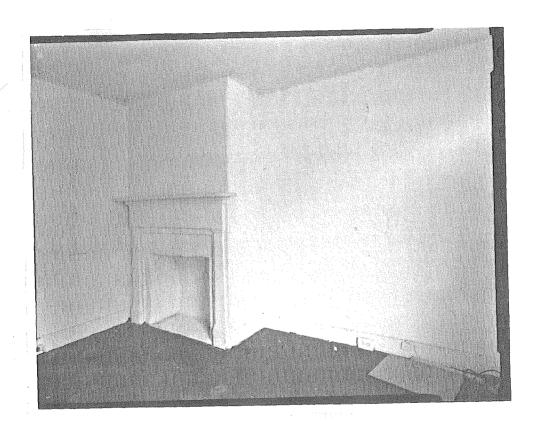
111-113 Ice Street, first floor: detail of the fireplace on the north wall of northeast room.
